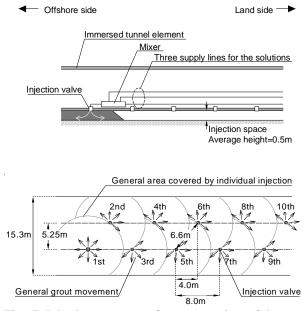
Injection sequence for construction of immersed tunnel foundations
